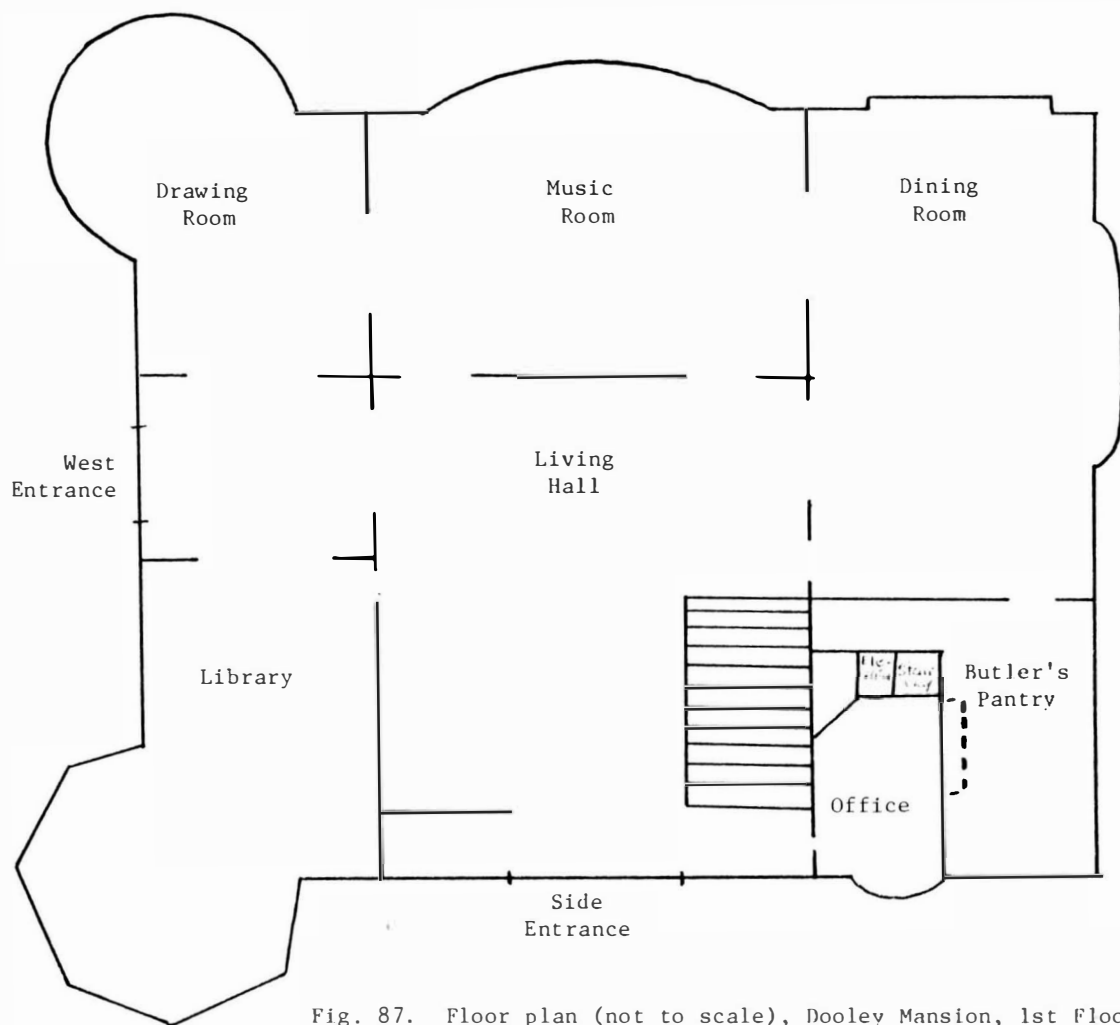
Floor plan (not to scale), Dooley Mansion, 1st Floor
